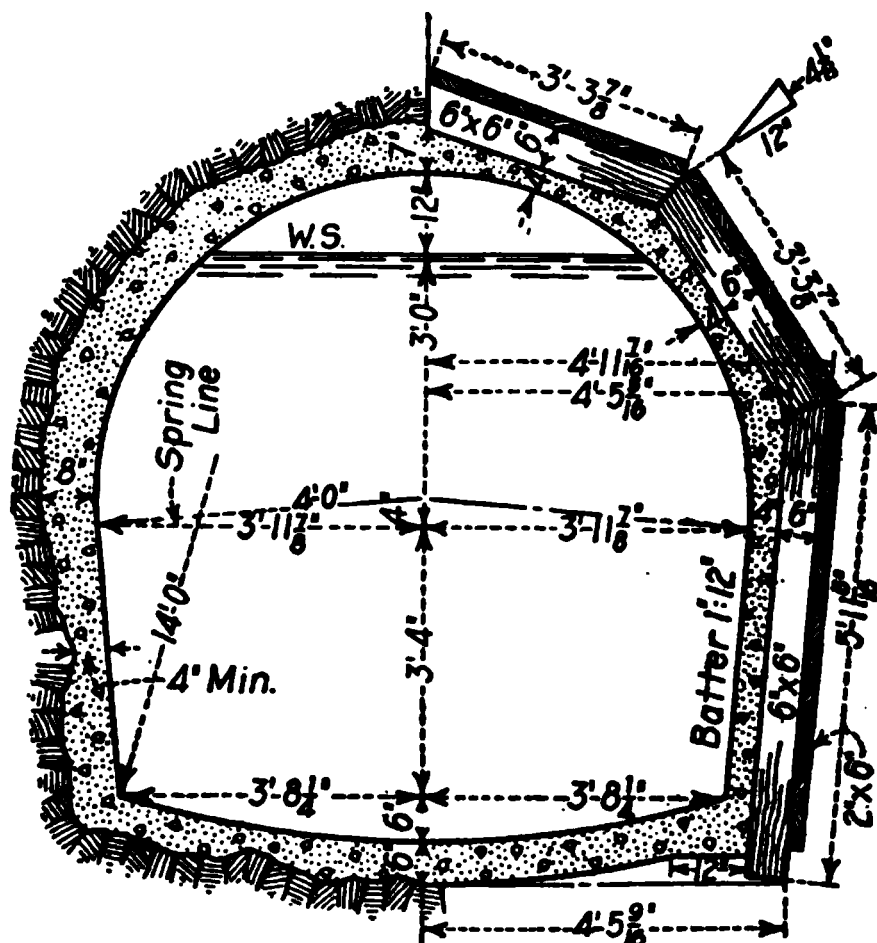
Tunnel section, Los Angeles City Trunk Line.
